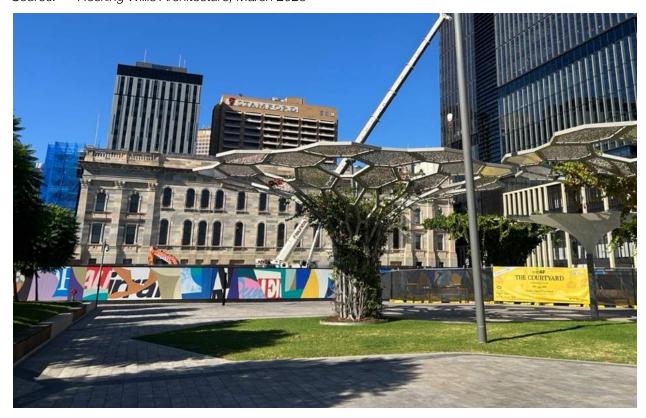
North façade of Parliament House viewed from Festival Plaza.
